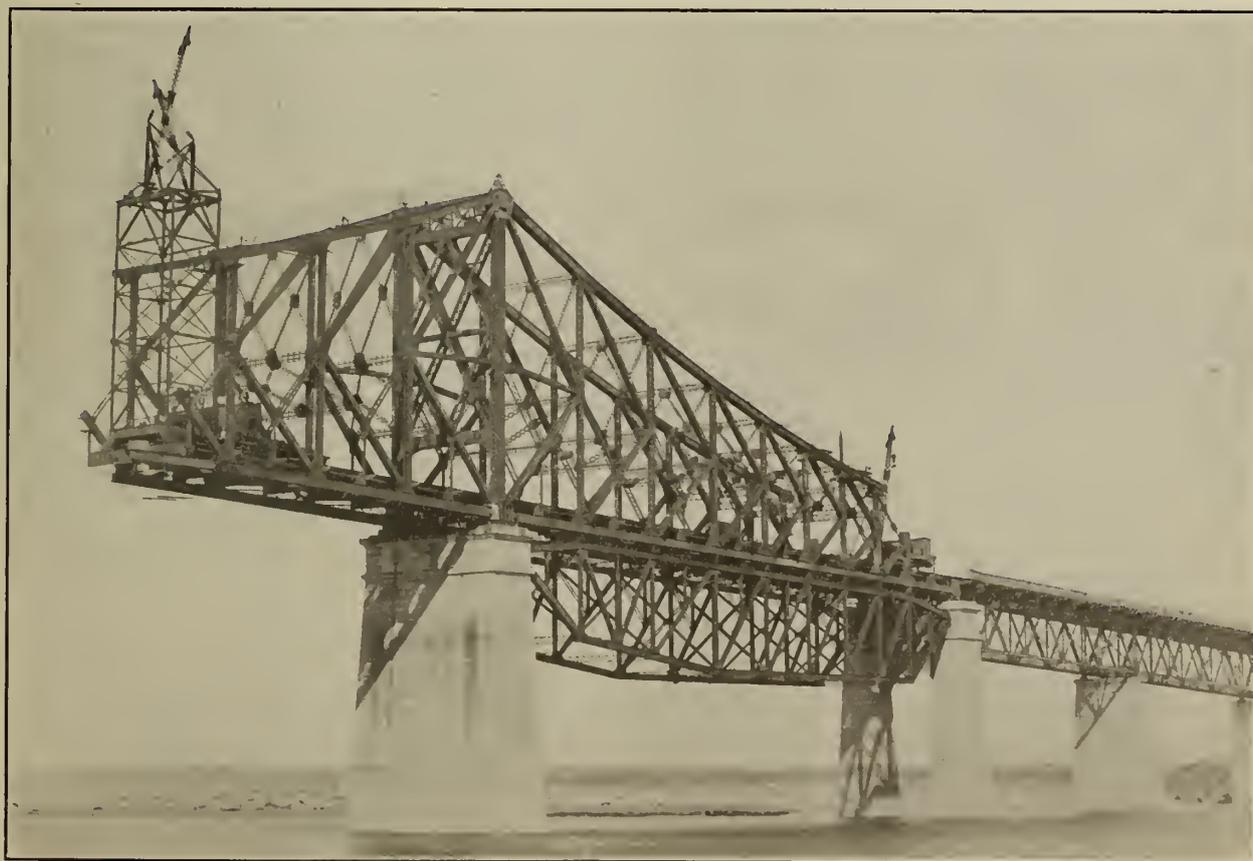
Main Span, South Side—Erection proceeding concurrently on Anchor and Cantilever Arms.
